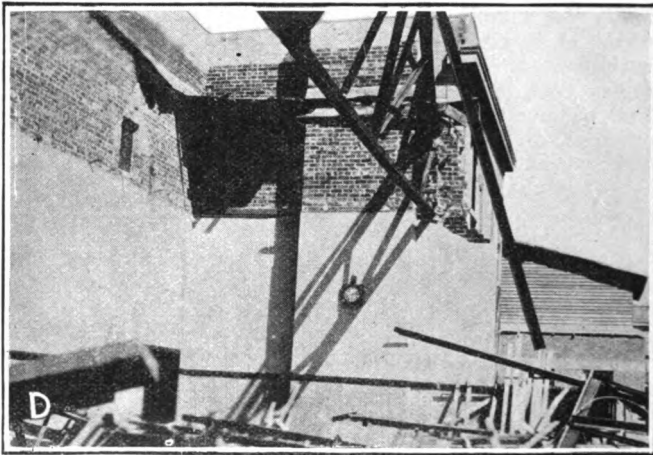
ONE ROOF TRUSS WAS LEFT HANGING TO THE WALLS.
